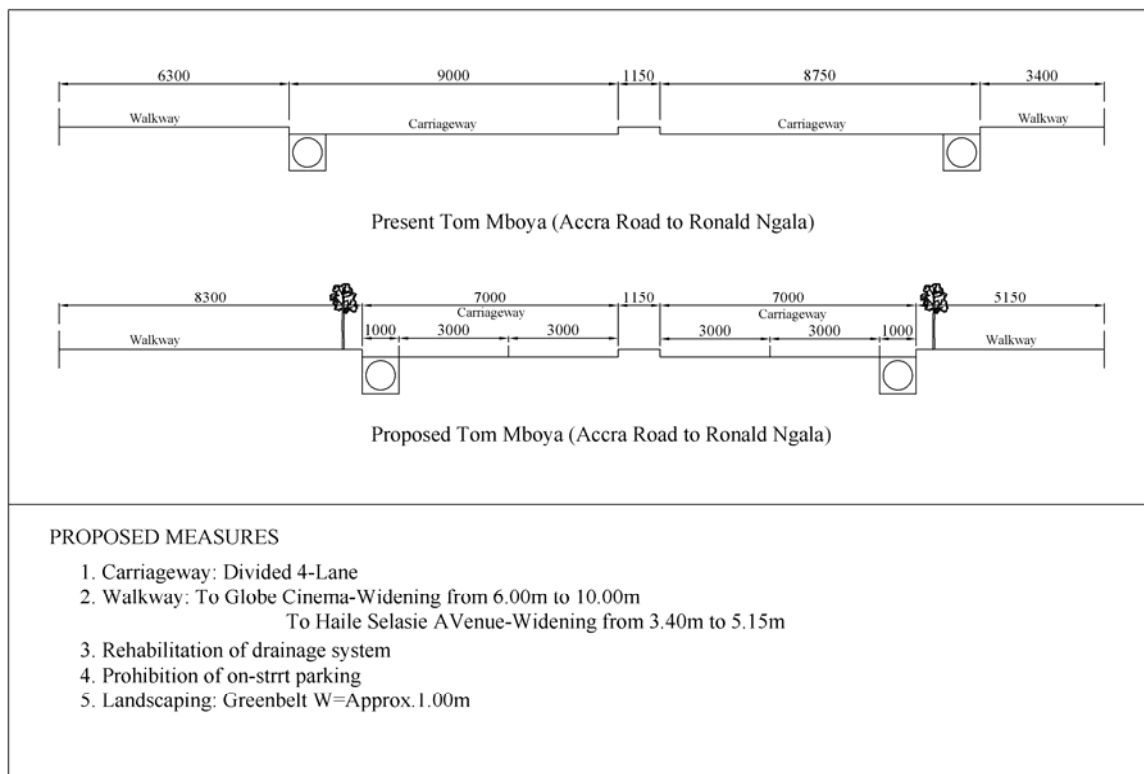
TYPICAL CROSS SECTION OF TOM MBOYA STREET
